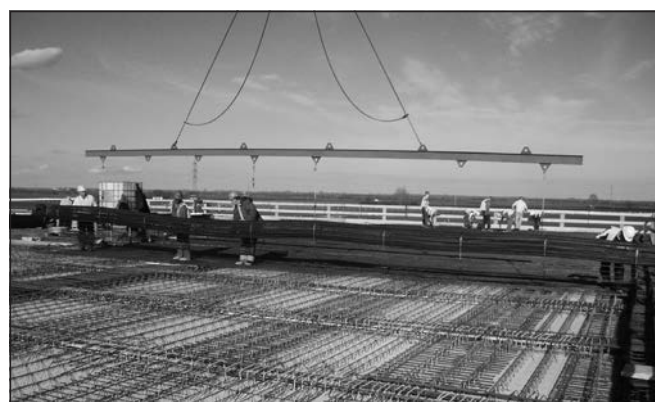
Placing BAMTEC reinforcement on precast formwork elements
